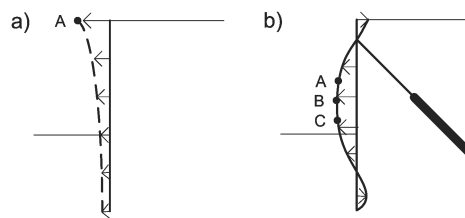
Sheet Pile Walls: a) Not Anchored b) Anchored (One Layer)
